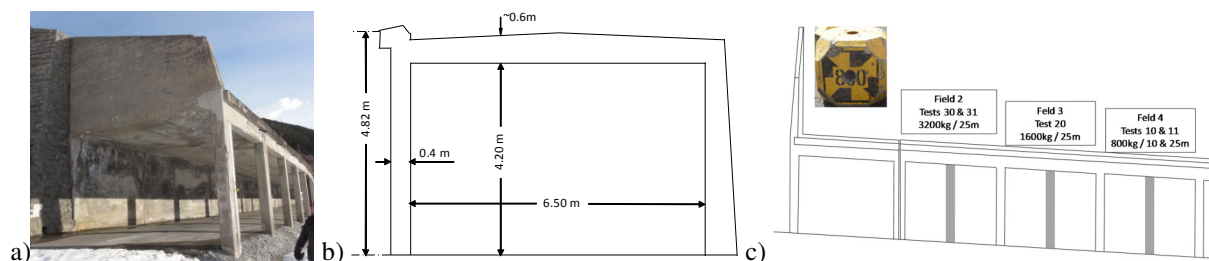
Protection gallery Parde 1: a) upper portal with first gallery fields = sections between valley side columns; b) cross section; c) testing fields & details with position of additional wooden columns and photograph of one test specimen.
